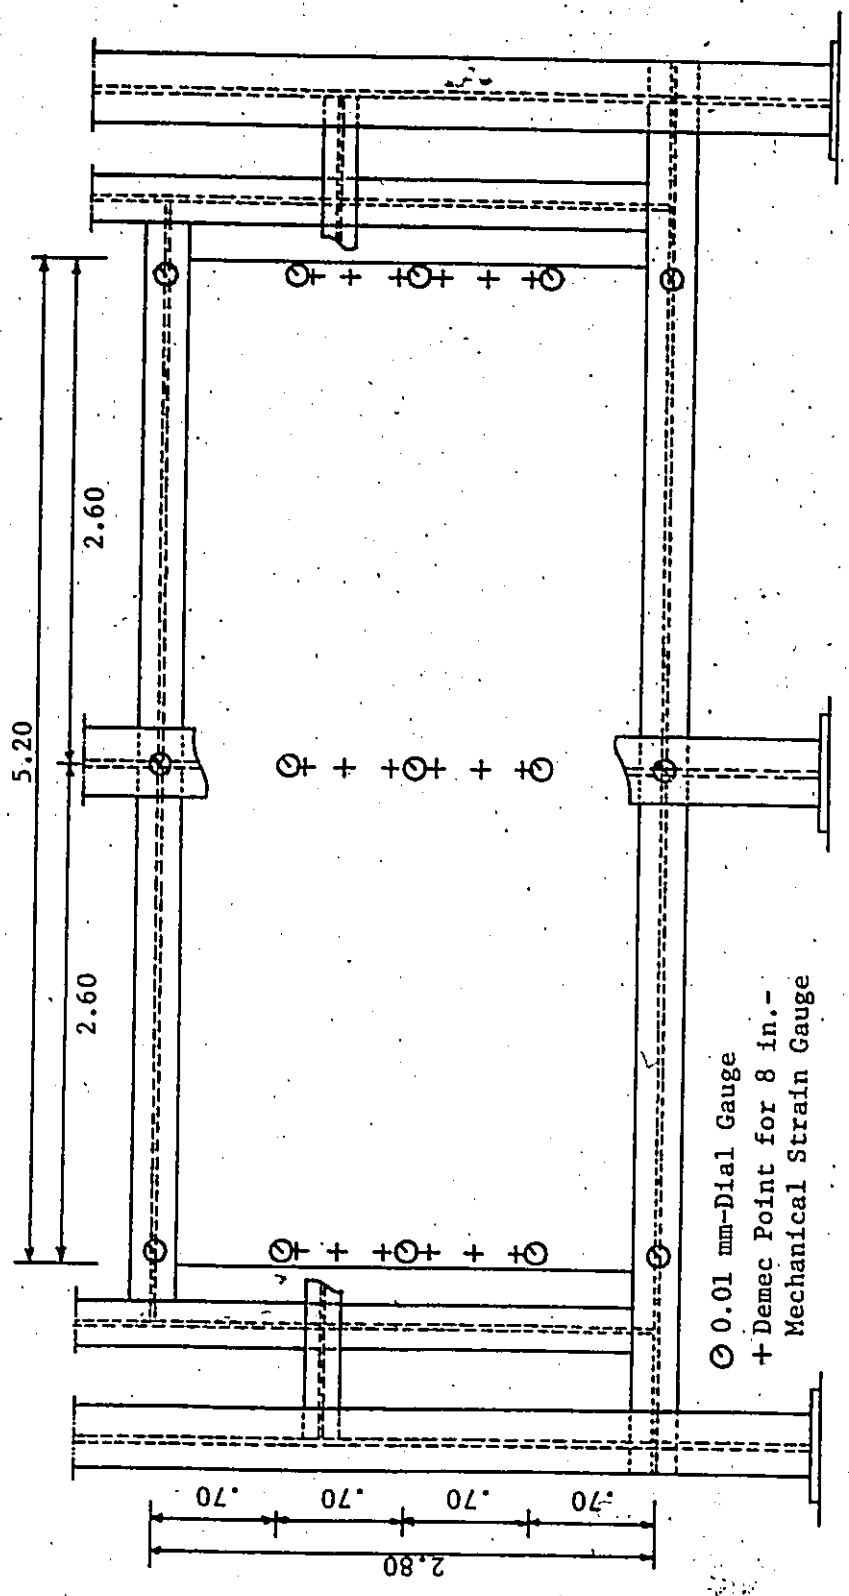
Instrumentation for Walls Supported Only on the Top and Bottom
